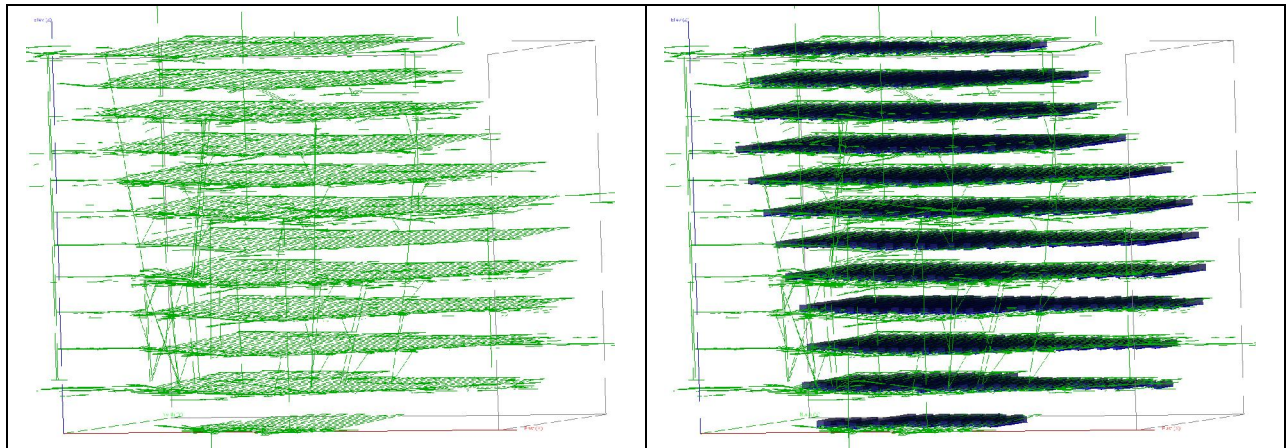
Real mine layout (left) and the tunnels created at PCSLC (right)
